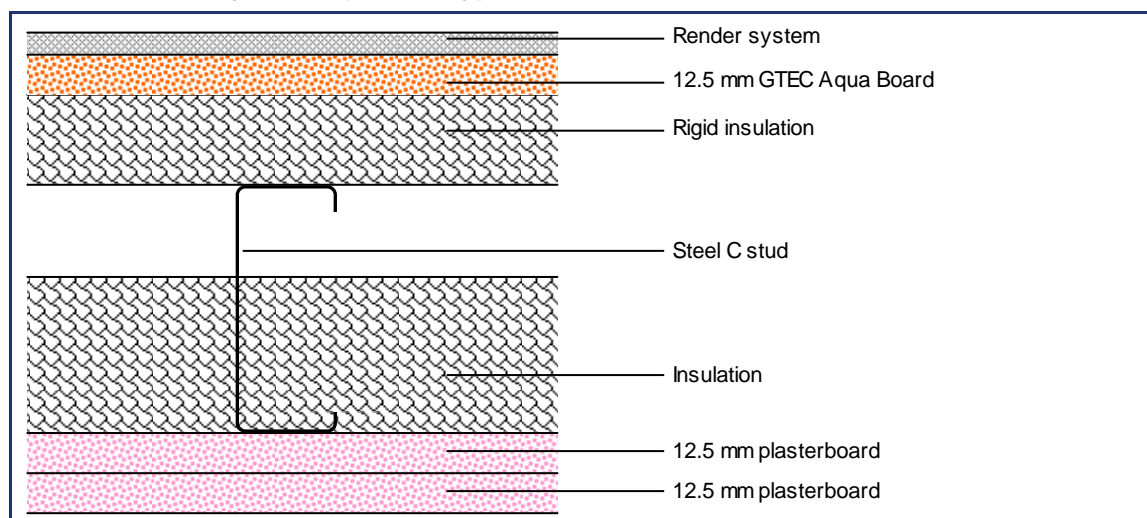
Aqua Board used as external sheathing board with EIFS with cavity
